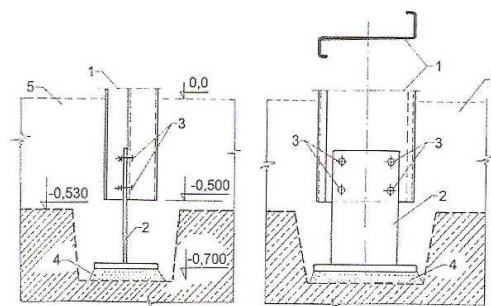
Typical secondary thin-walled column to foundation connection: 1- column, 2- column base, 3- bolts, 4- base mortar, 5- concrete
